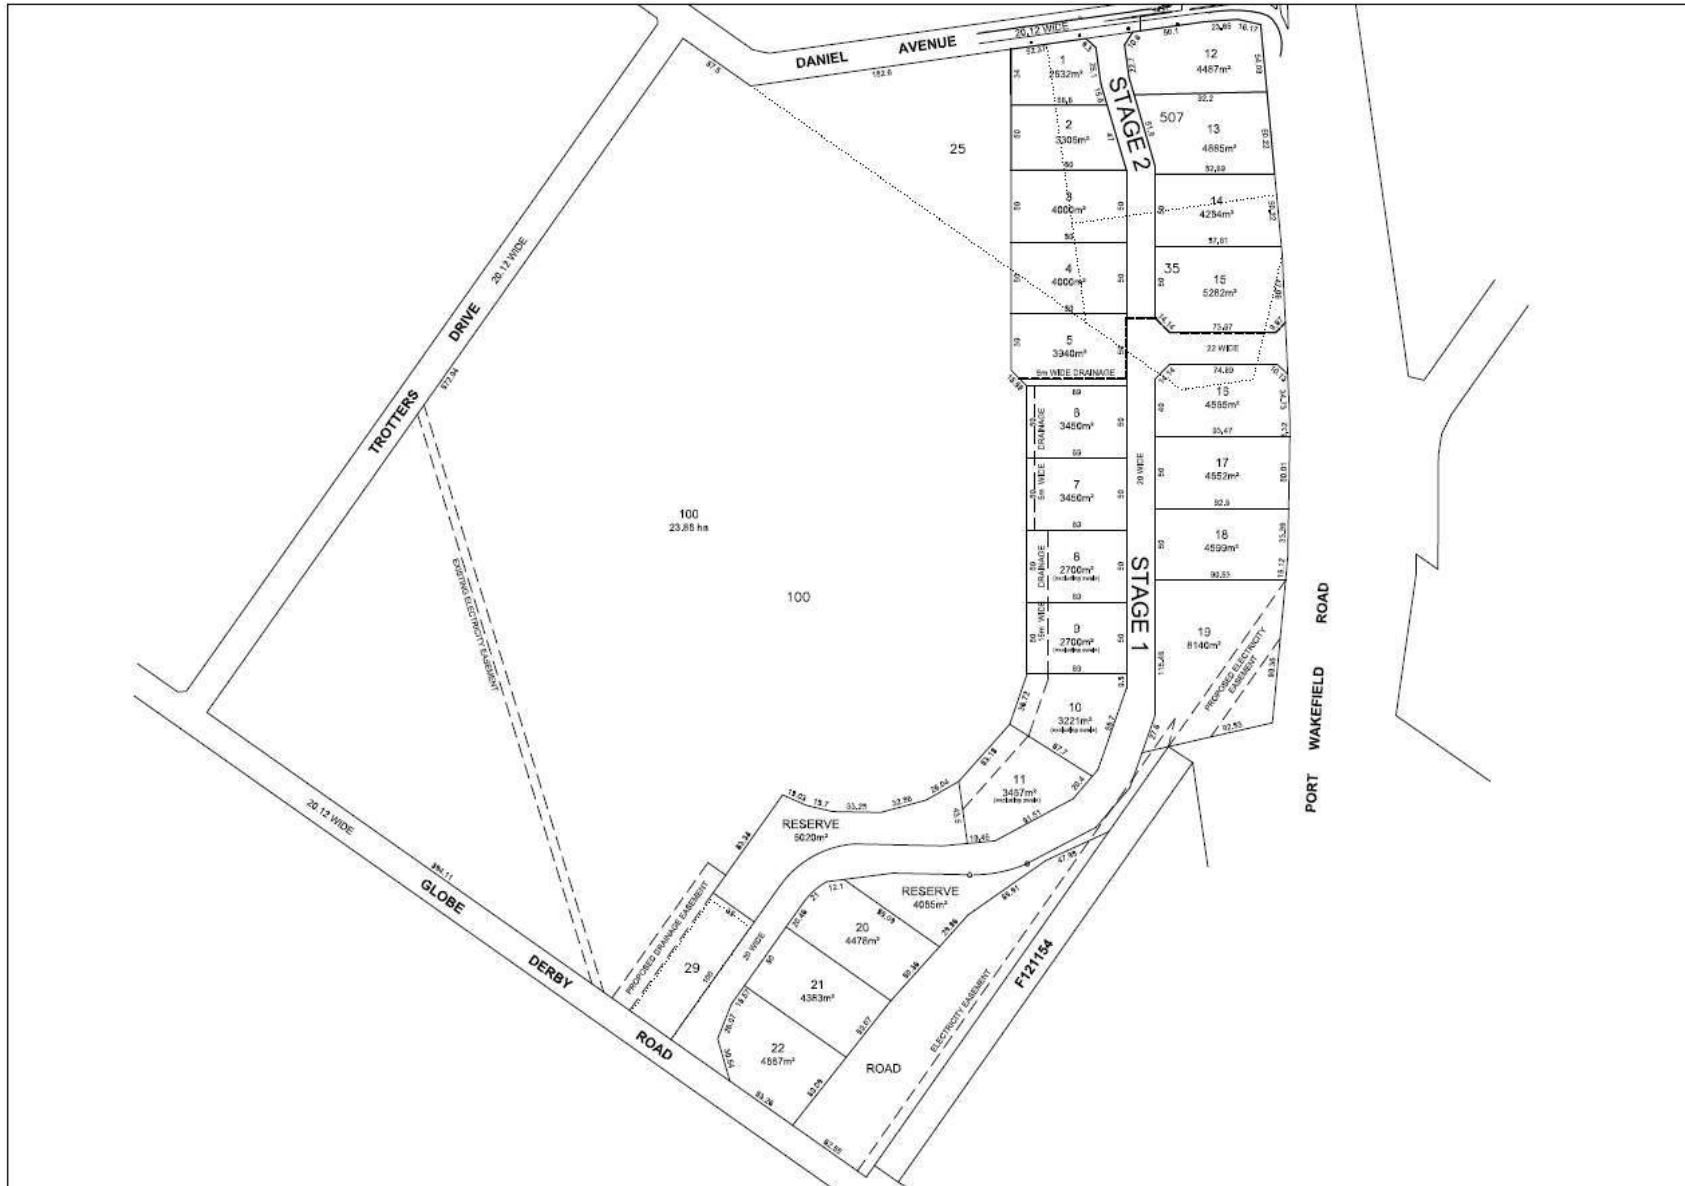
Concept plan proposed layout (supplied by SeymourGroup on 26/05/2023)
